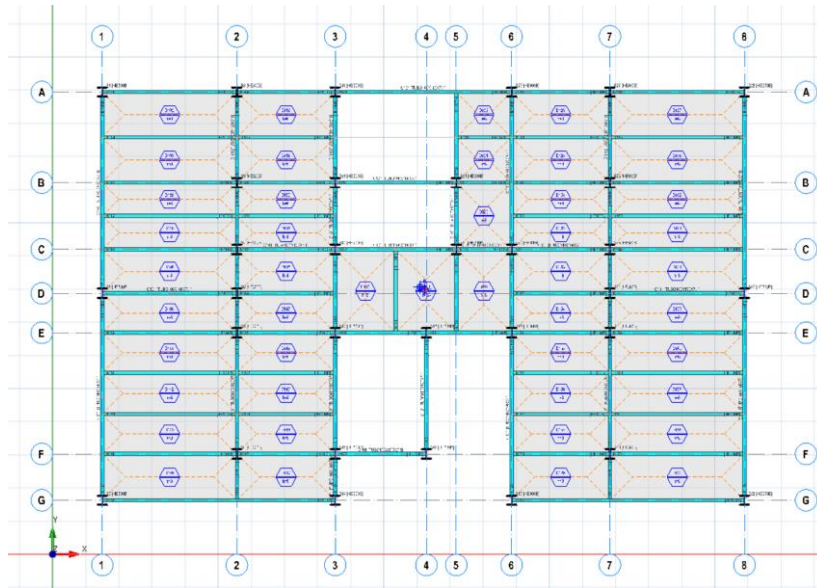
Floor Plan of SS10 Model in ProtaStructure
